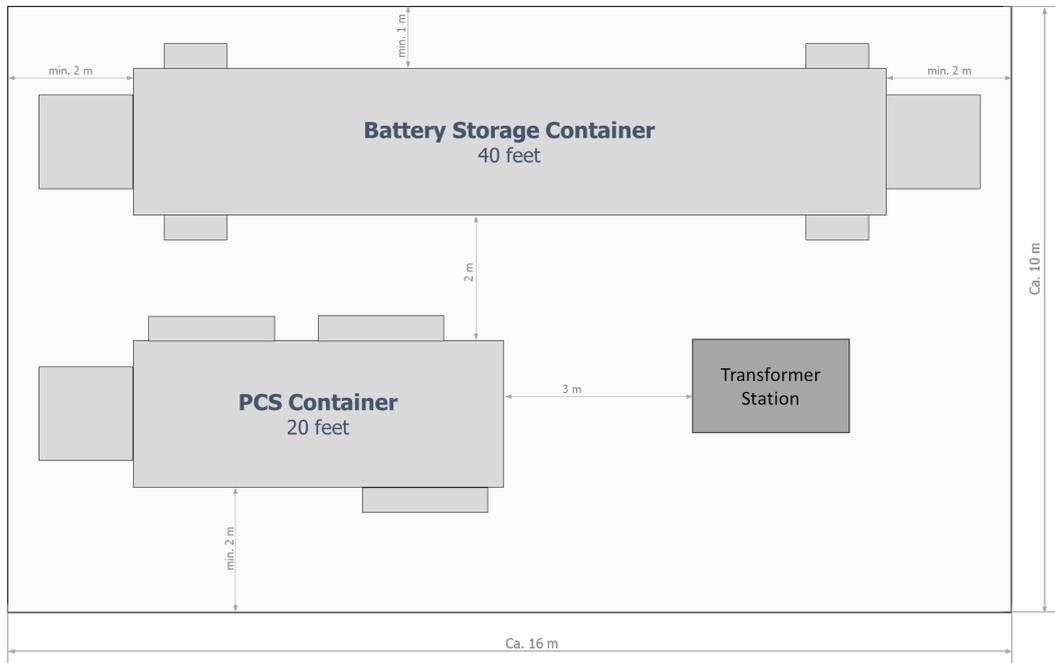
Indicative dimensions for example site Battery Storage System extension
